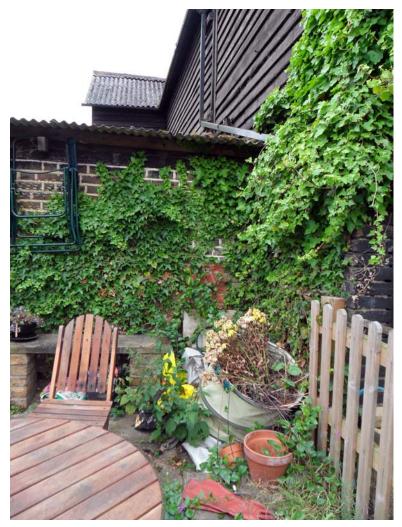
Building 5, exterior west face showing two possible phases of wall build
